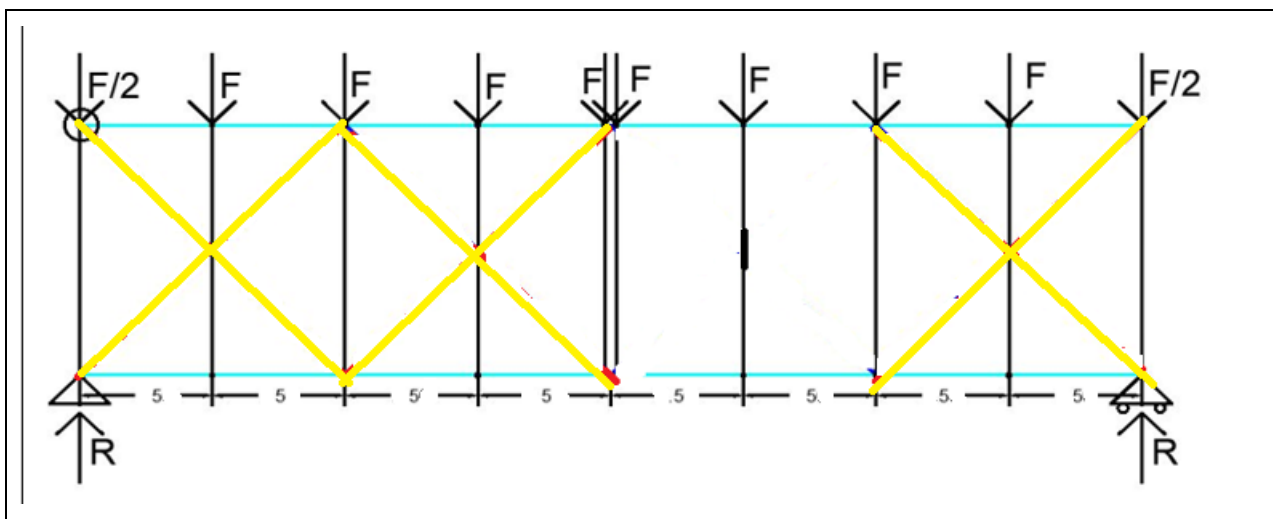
Distribution of wind load considered in the longitudinal direction
